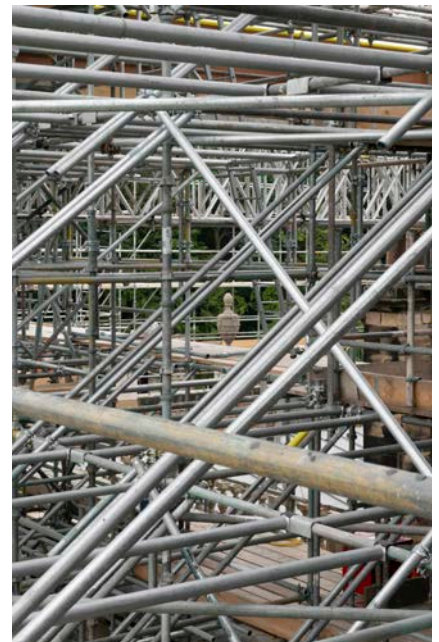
Birdcage Scaffold, Wentworth Woodhouse.
